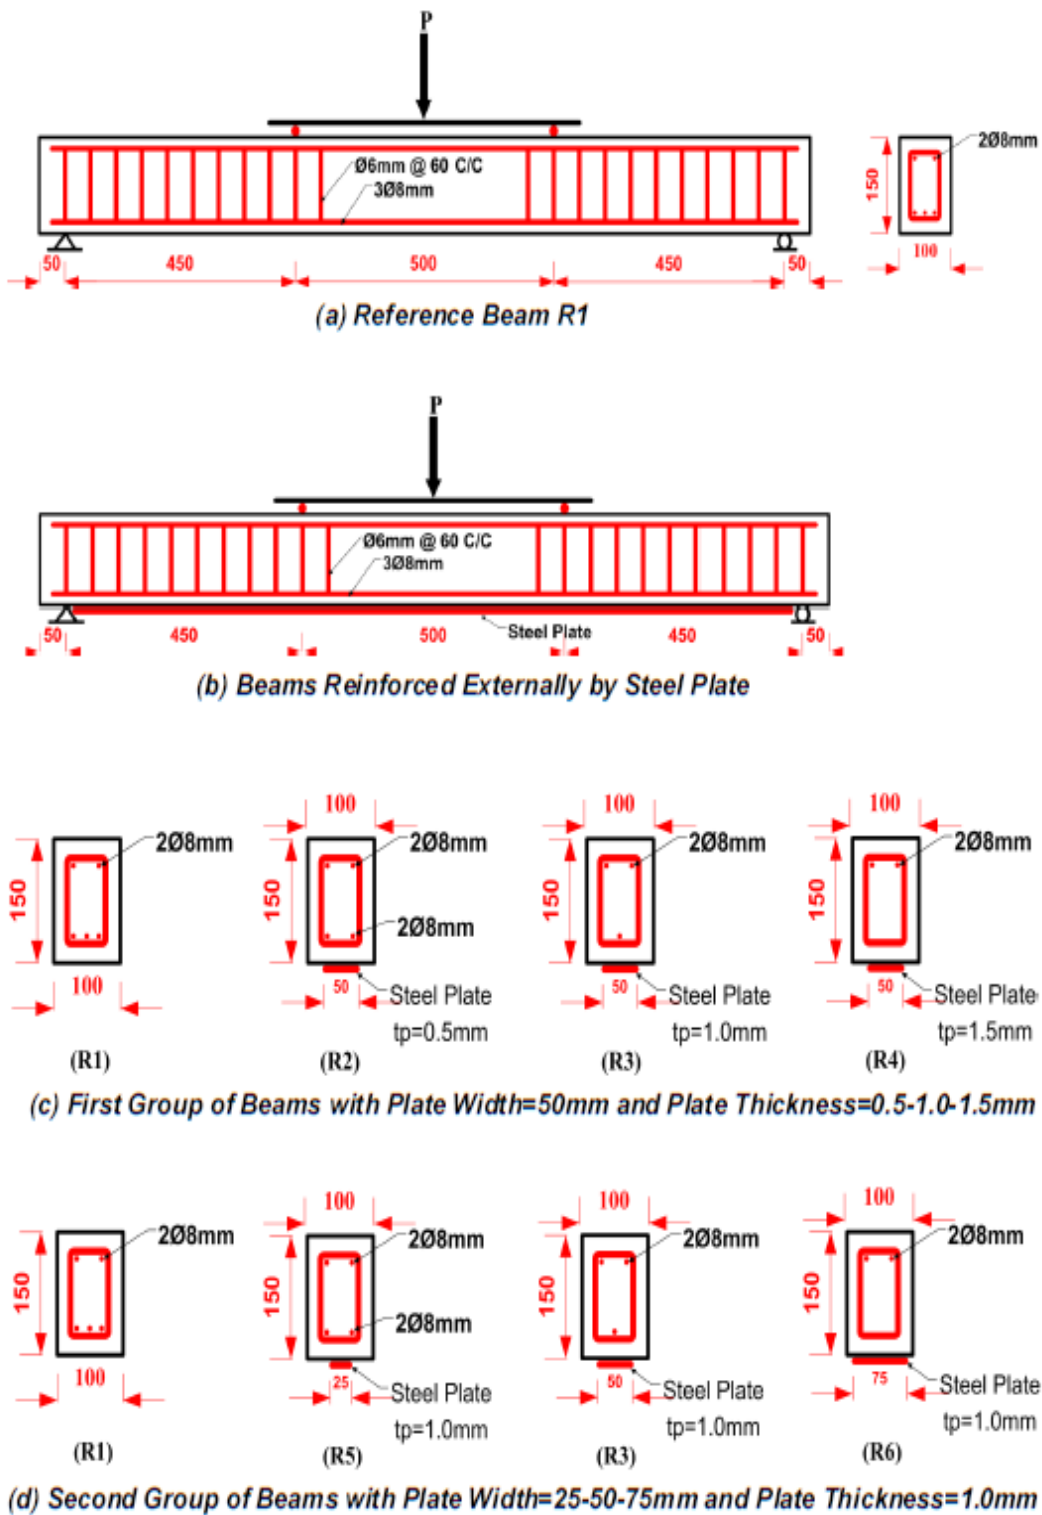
Details of the Reinforced concrete beams (Ajeel, Ghedan, & Hamza, 2011)
